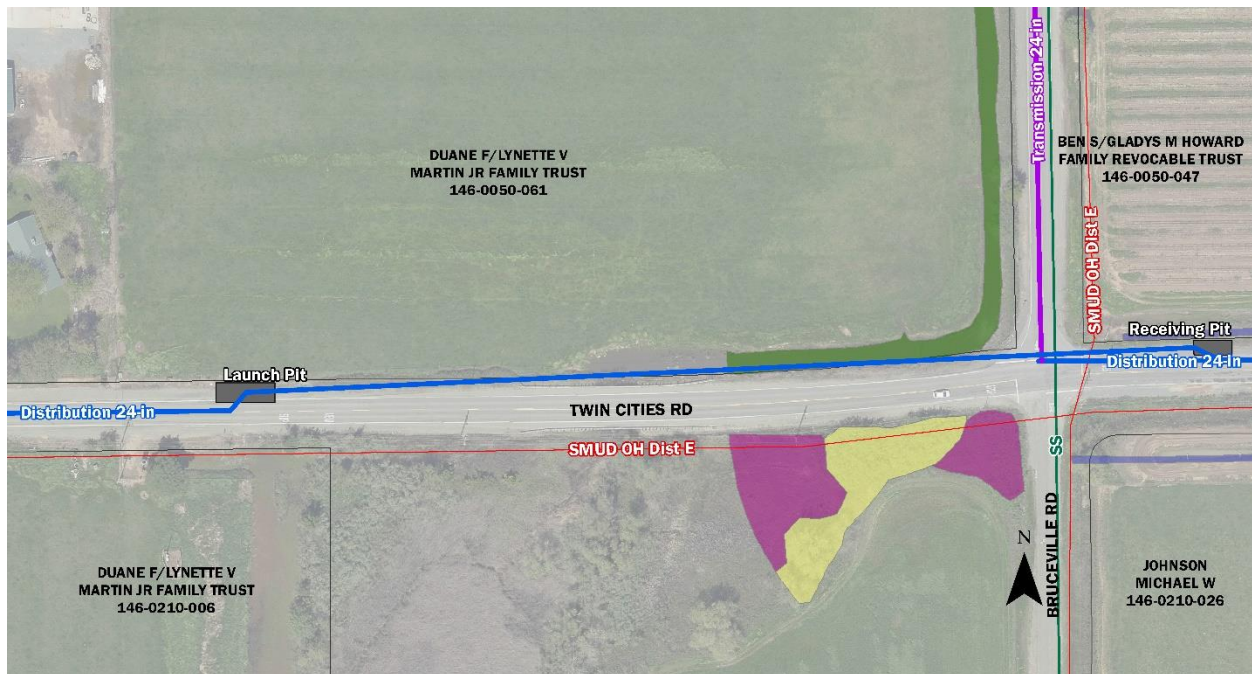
Proposed Trenchless Crossing of Drainage at Twin Cities Road
